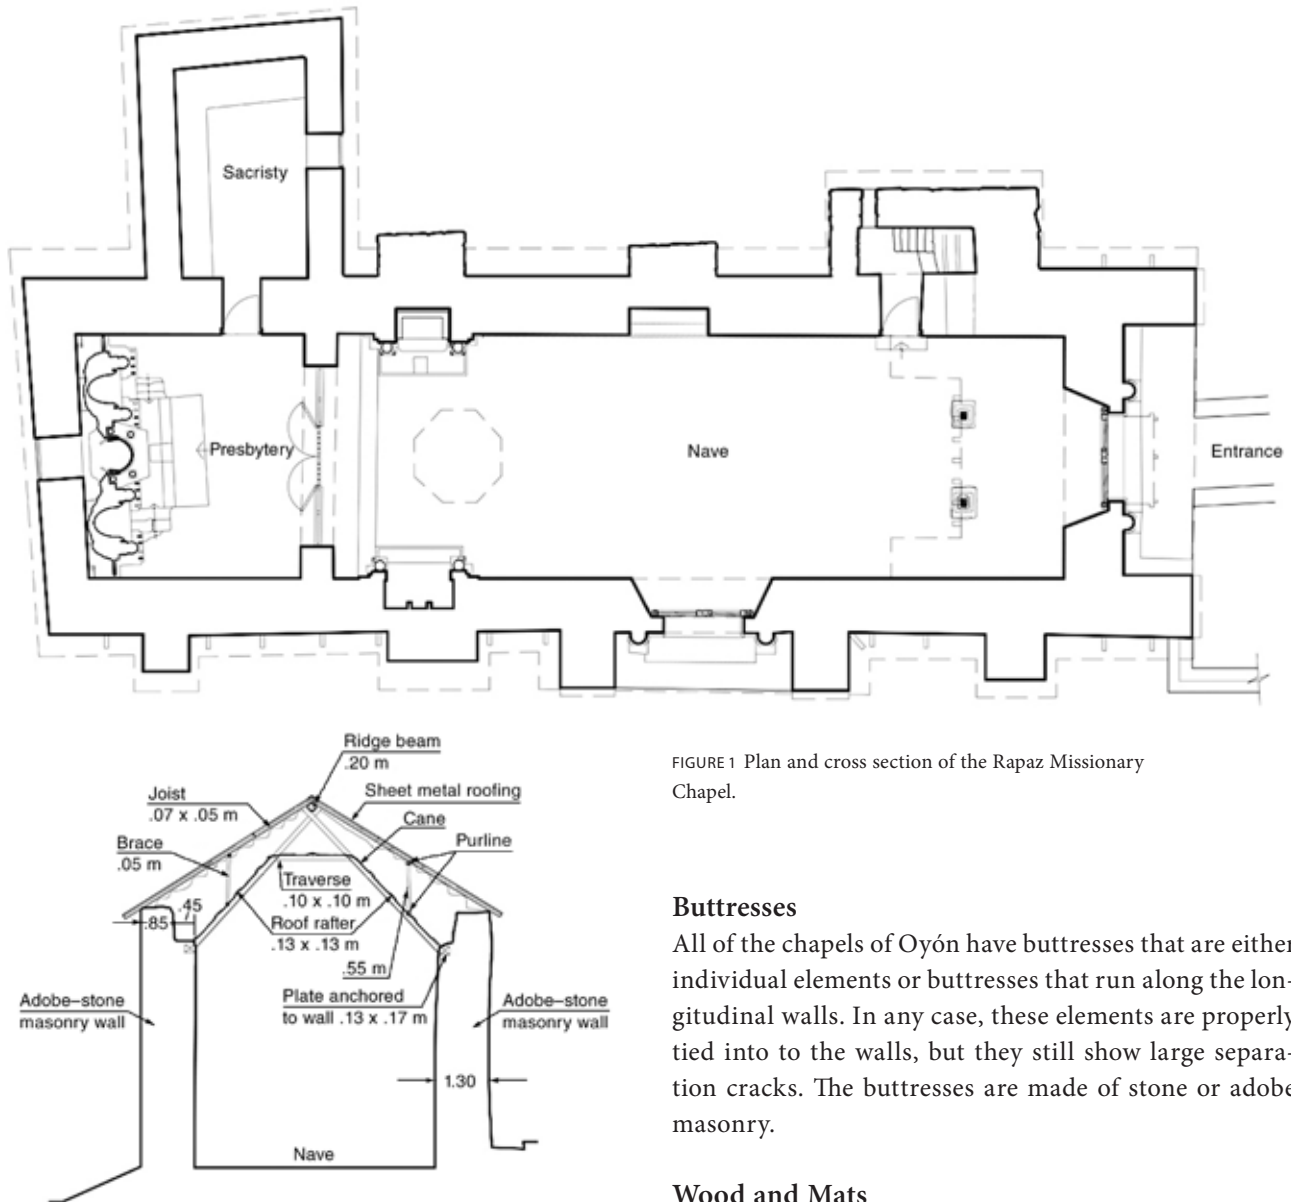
Plan and cross section of the Rapaz Missionary Chapel.
